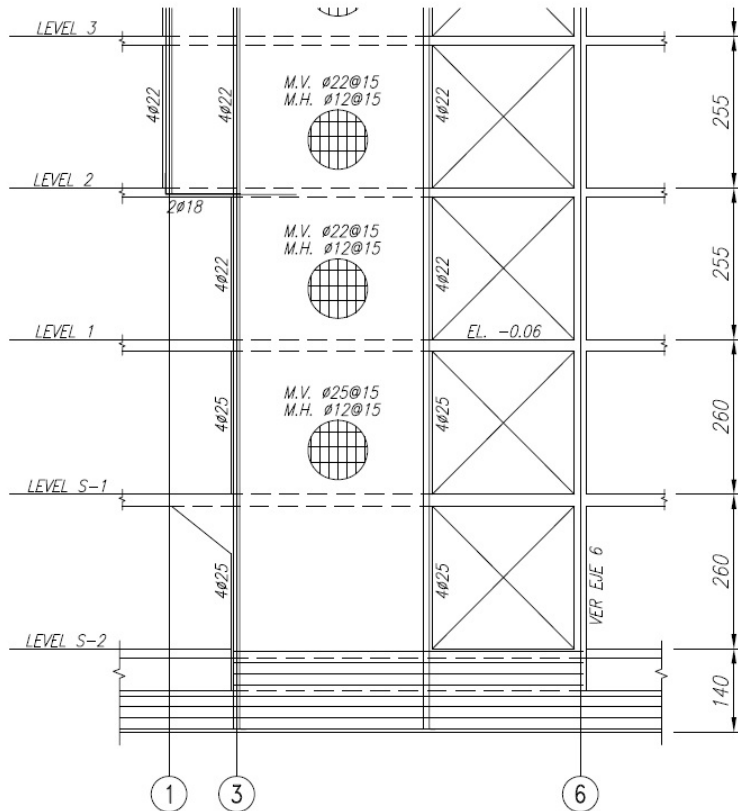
Elevation view of wall K, dimensions in cm (1 cm = 0.39 in.).
